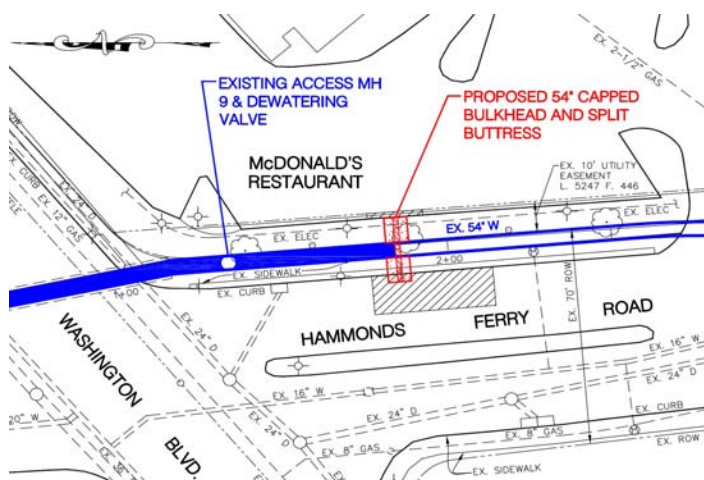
Plan of Bulkhead and Buttress for 54-inch Pipe
